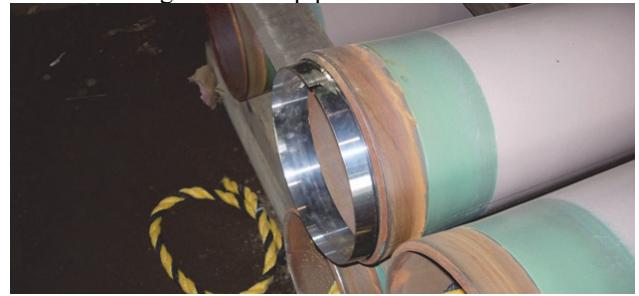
Unique 9-in heavy wall cable pipe with backing ring.
